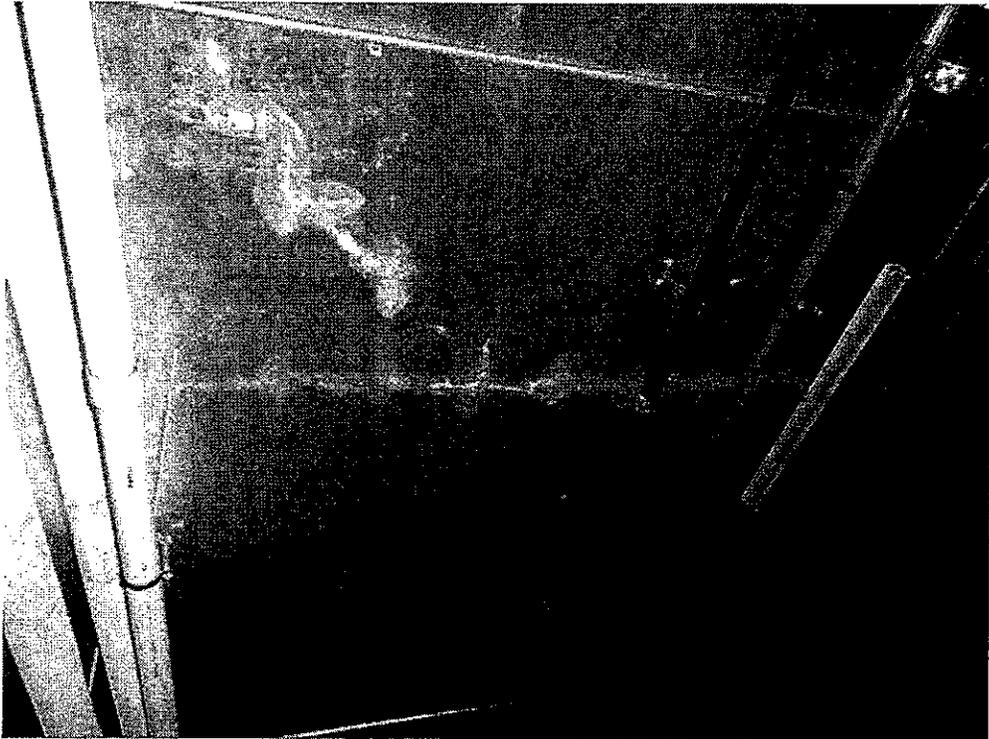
Cracking with efflorescence in the 2<sup>nd</sup> story slab soffit of Building B
